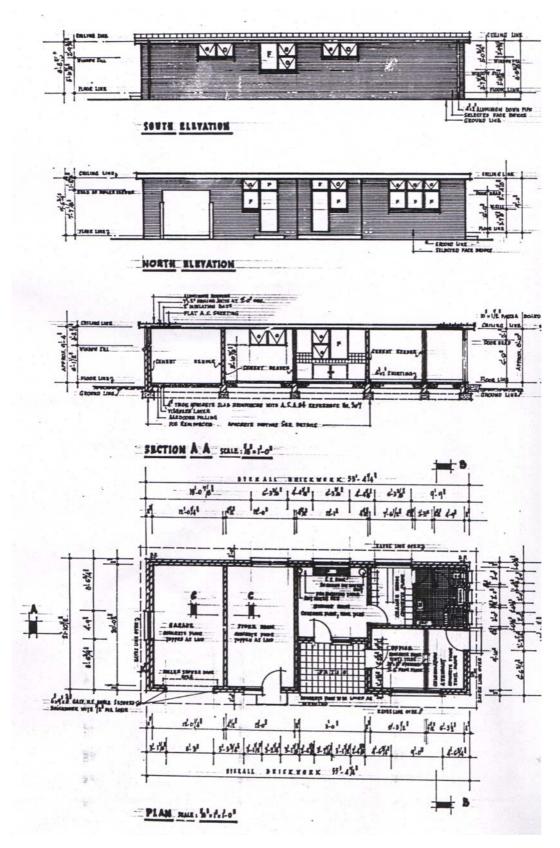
Proposed W.S.O. Depot at Holden Street, Ashfield. Plans, Elevations, Sections and Details. Dated as Recommended 22.5.67. Plan No 37-39-2 Sydney Water Plan Room
